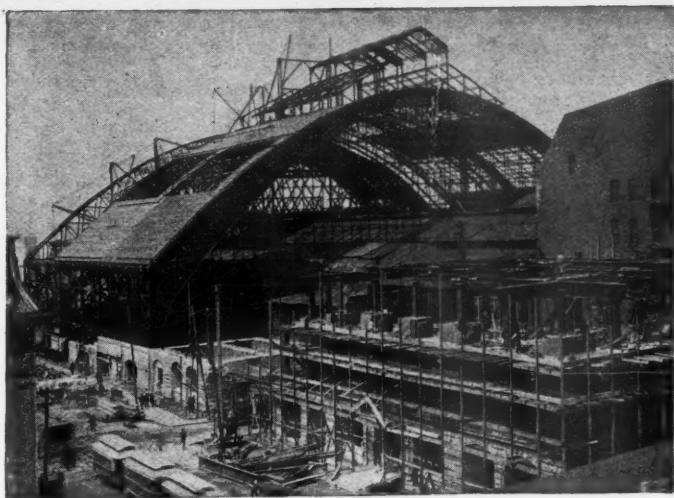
Northwest from Fourth Story of City Hall. April 26.
